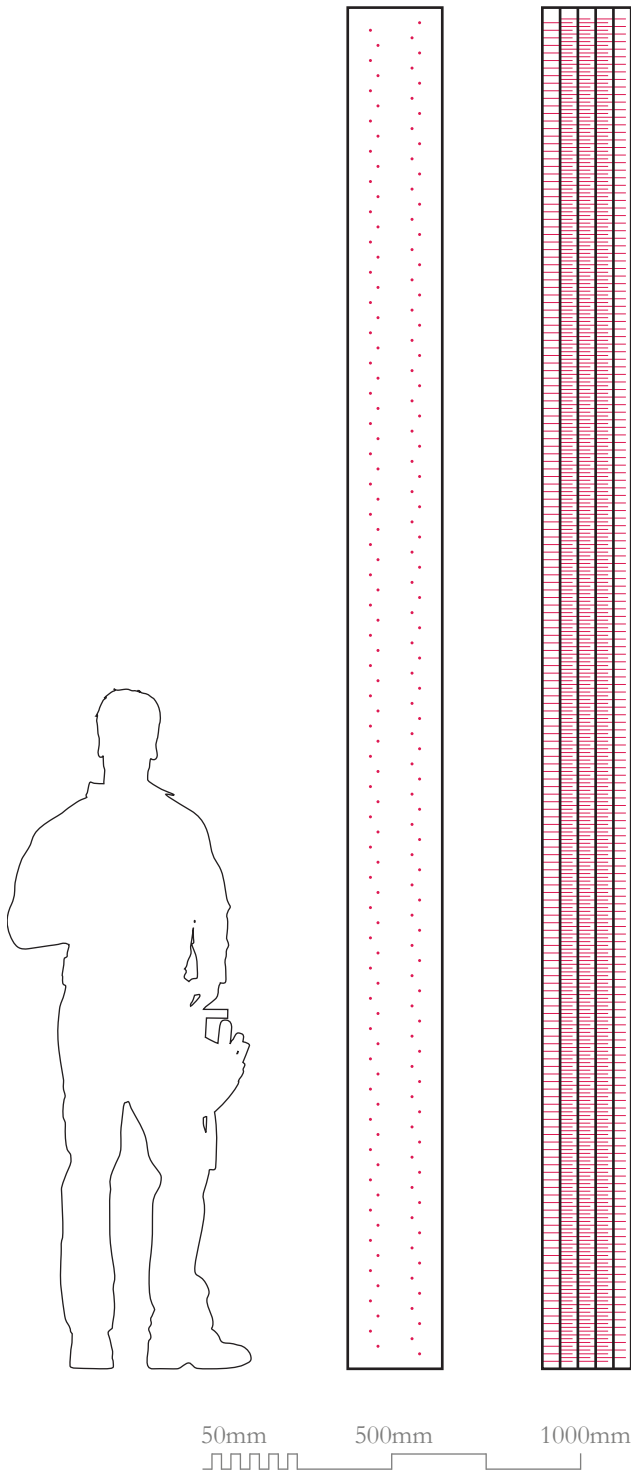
Drawing of a nail-laminated column with an effective fastener spacing of 20mm.
